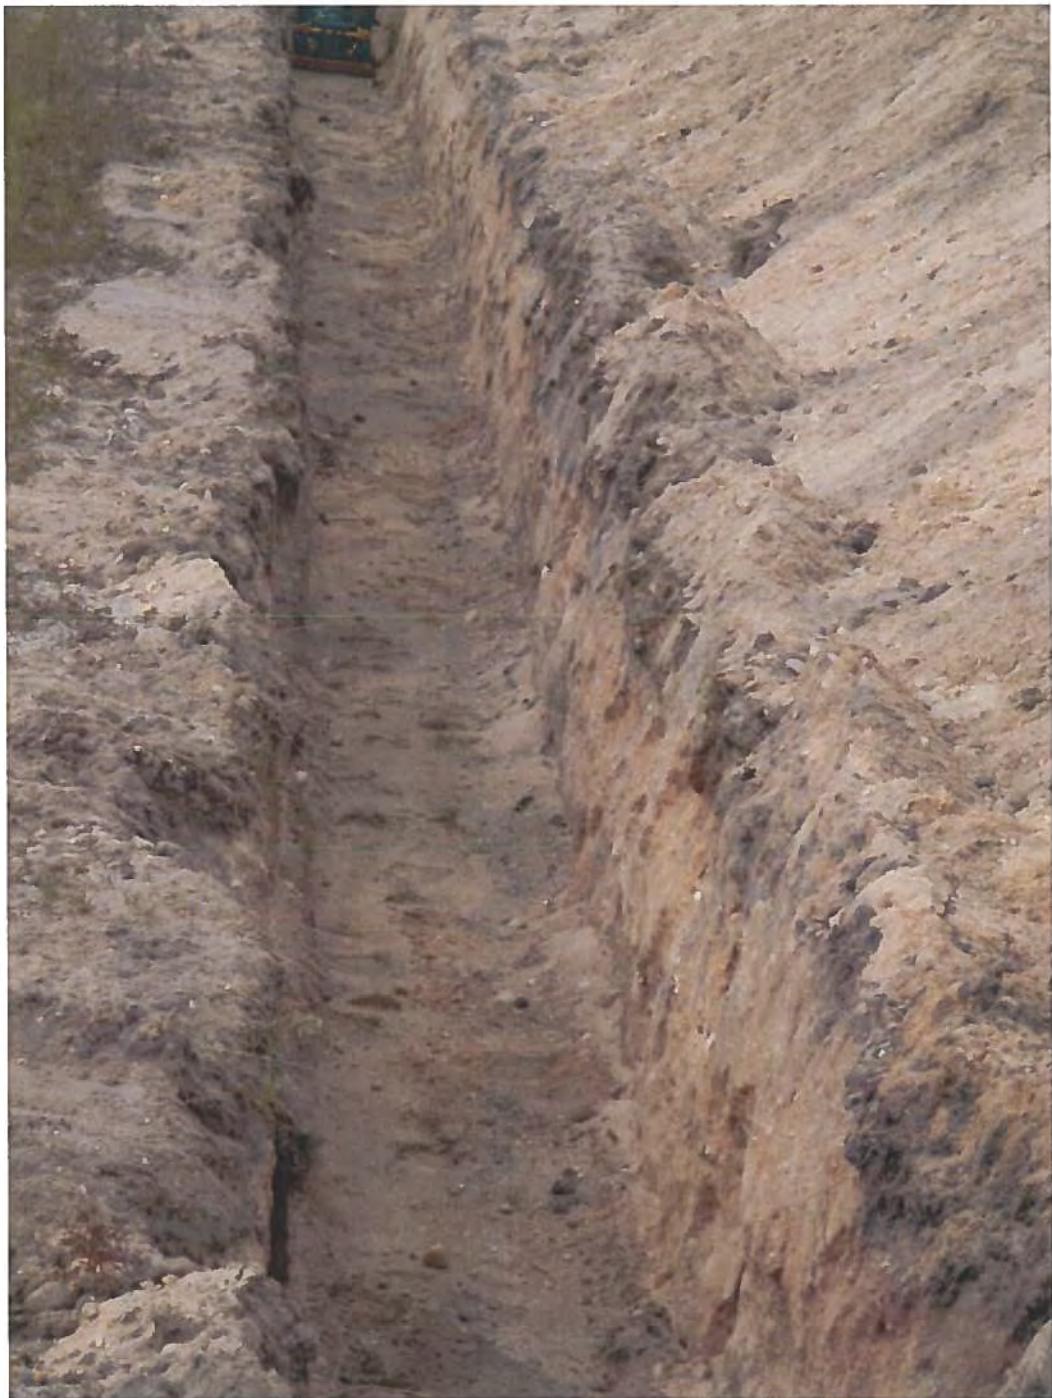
Excavation of 2-ft Trench for New Air Sparge LInes
